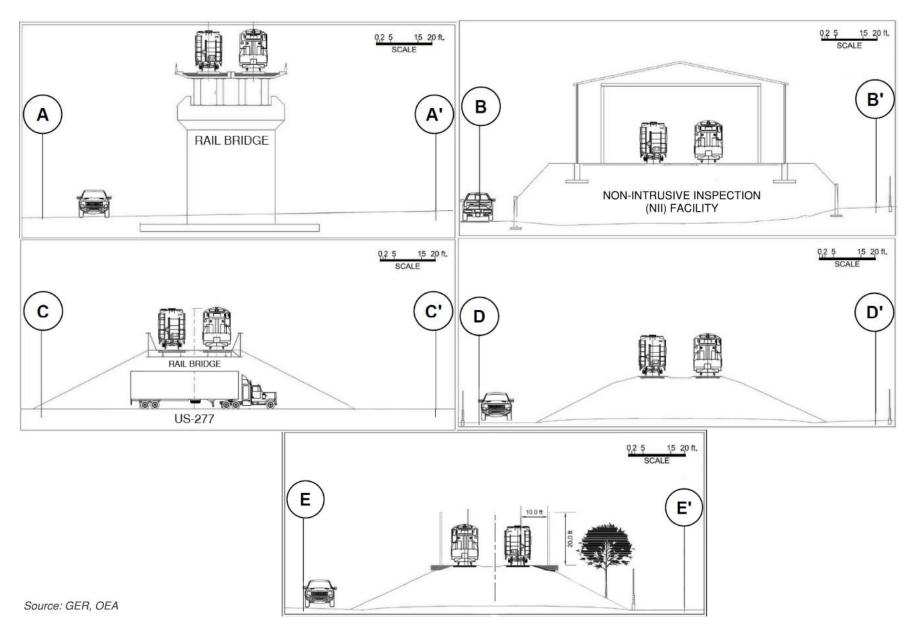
Northern Rail Alternative Conceptual Cross Sections
